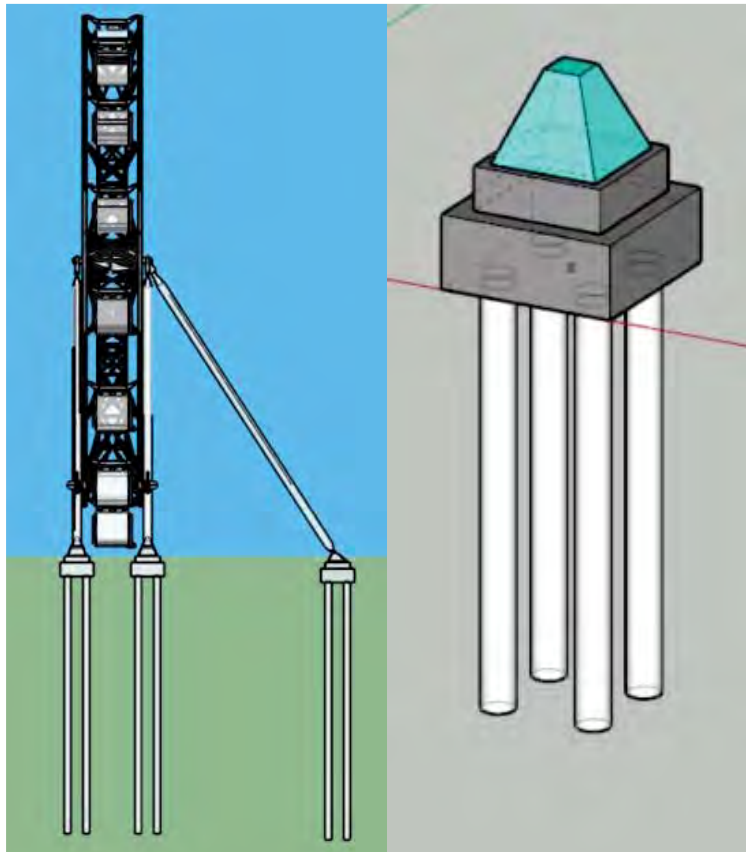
Section looking north, illustrating possible Observation Wheel height and foundation arrangement and typical schematic pile cap arrangement (Walsh 2021, 22)
